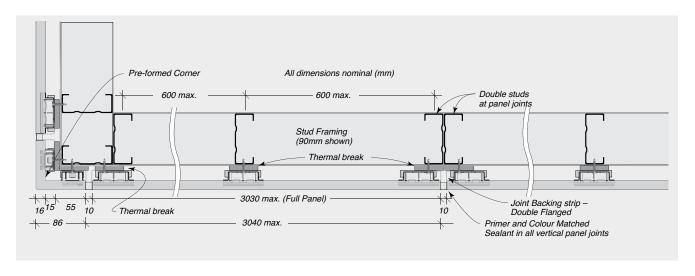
Typical Framing Set-Out with 75mm Steel Framing and Territory Pre-formed Corners – Plan View
